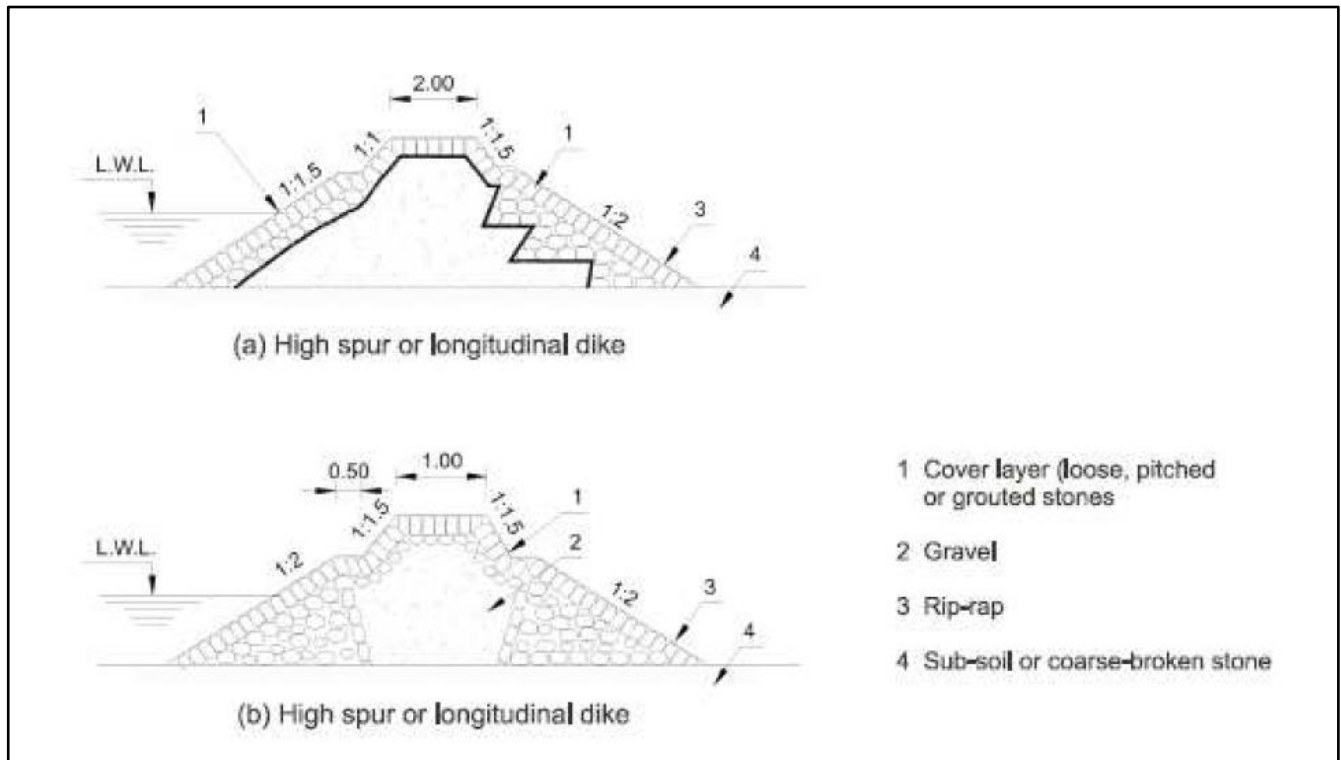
Typical cross Sections of a longitudinal dike (Source: (CIRIA 2007))
